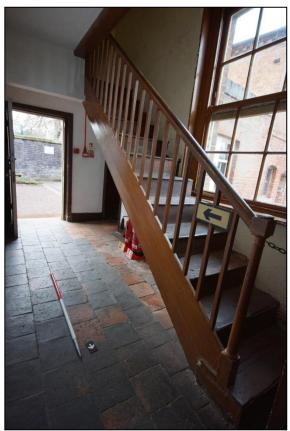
Hallway 07, viewed looking west-south-west. Scale = 1m.
